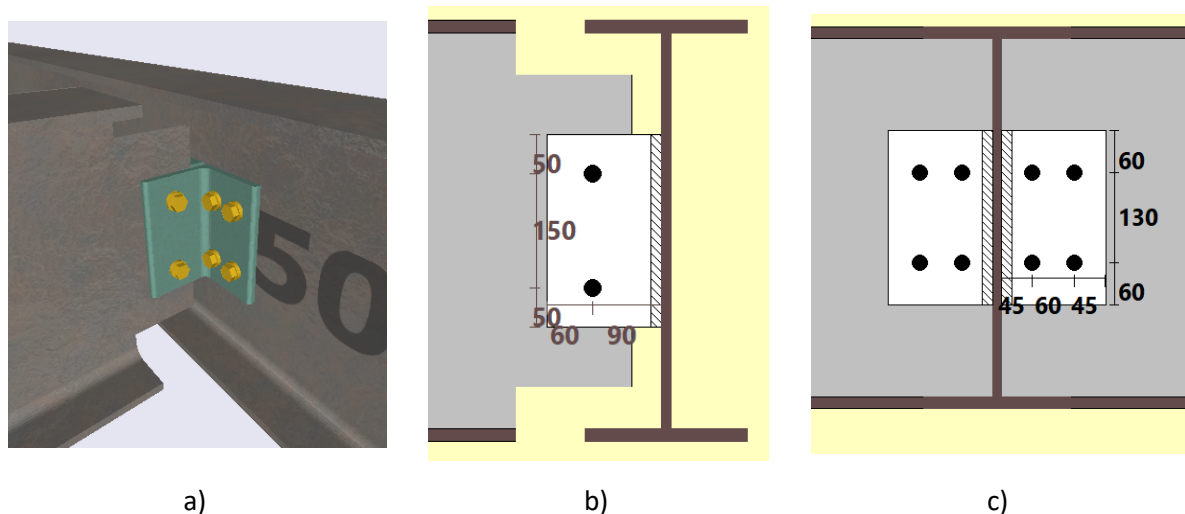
Configuration of pinned joint – frames B/1-7, C/1-7 – SS/S: a) 3D view of the joint, b) side view of the joint, c) front view of the joint
